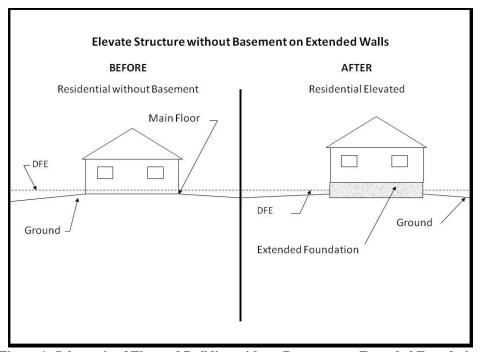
Schematic of Elevated Building without Basement on Extended Foundation
